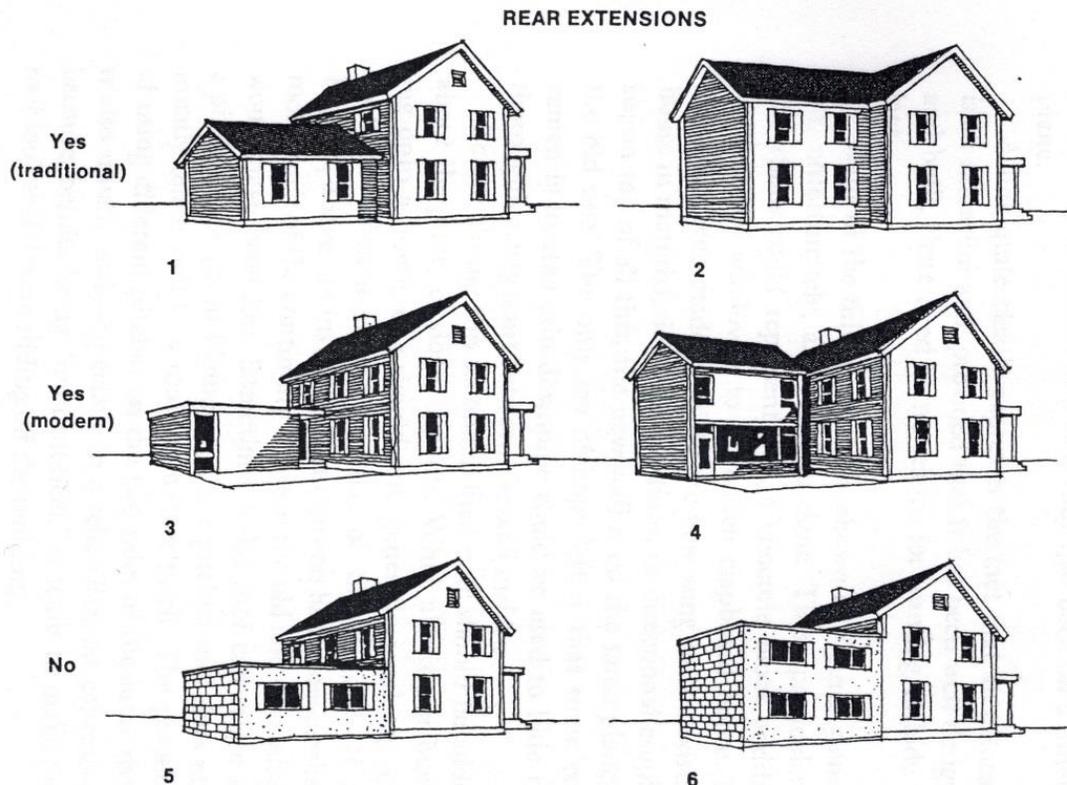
General guidance for adding “rear extensions” to a heritage building (from Stephen 1972:108). As currently proposed, the design follows illustration “2” under “traditional”
